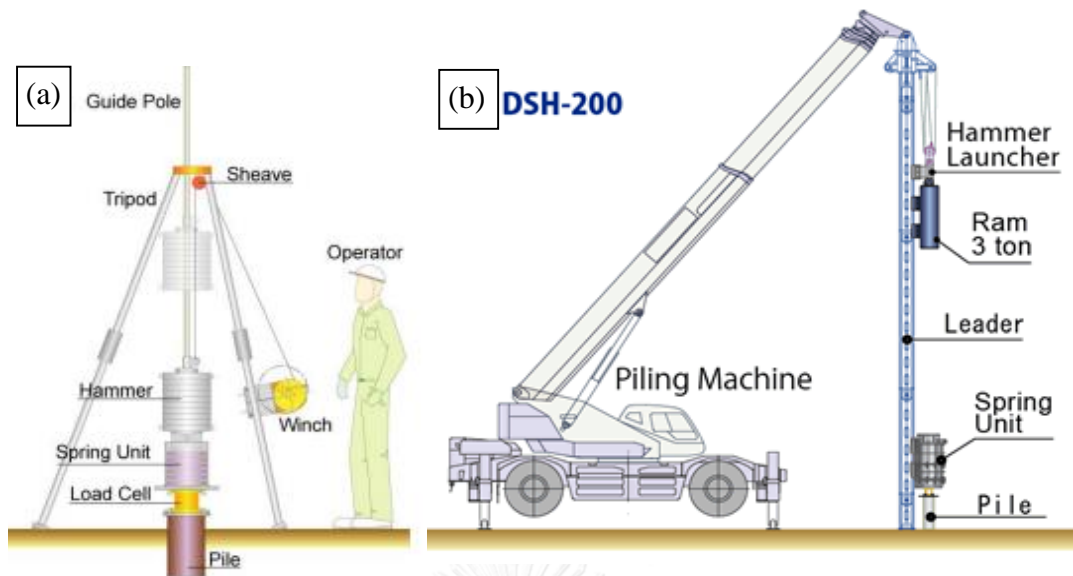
Spring hammer test device, (a) portable type, (b) machine-mounted type (Matsuzawa et al., 2008).
